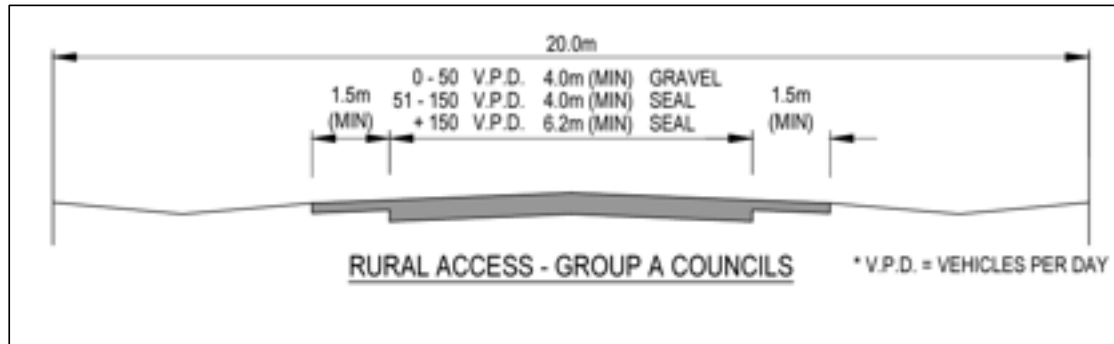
Rural Access Cross-Section (IDM Standard Drawing SD610)
